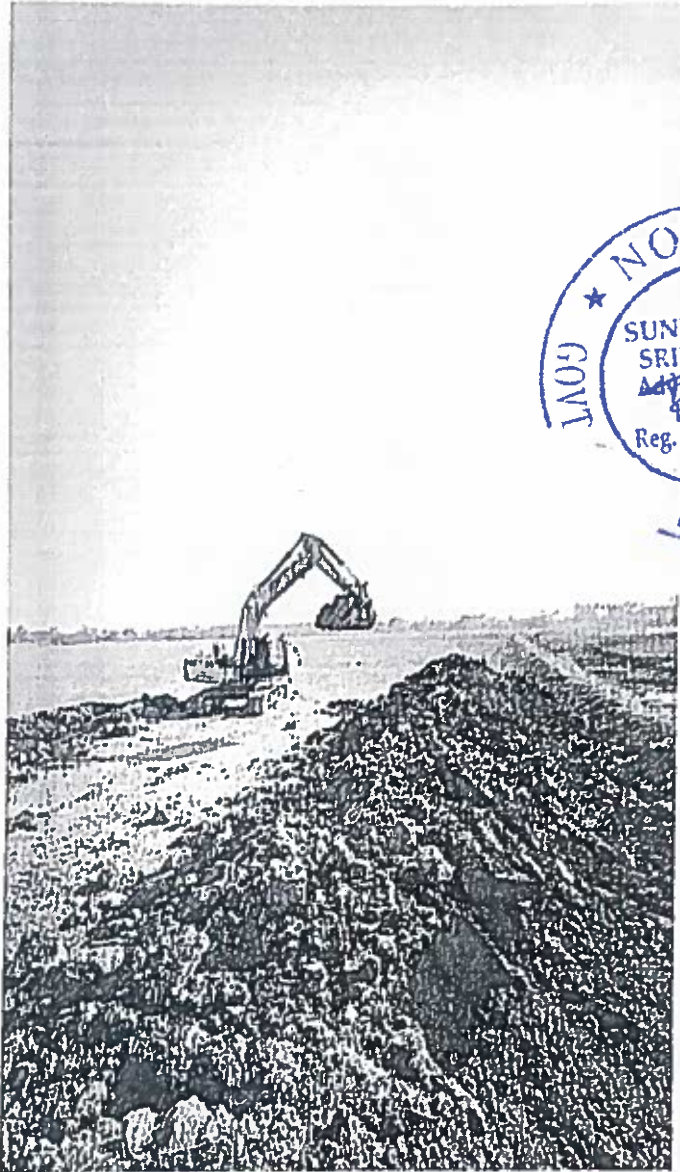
Active Excavation Works (26 Feb 2026)
